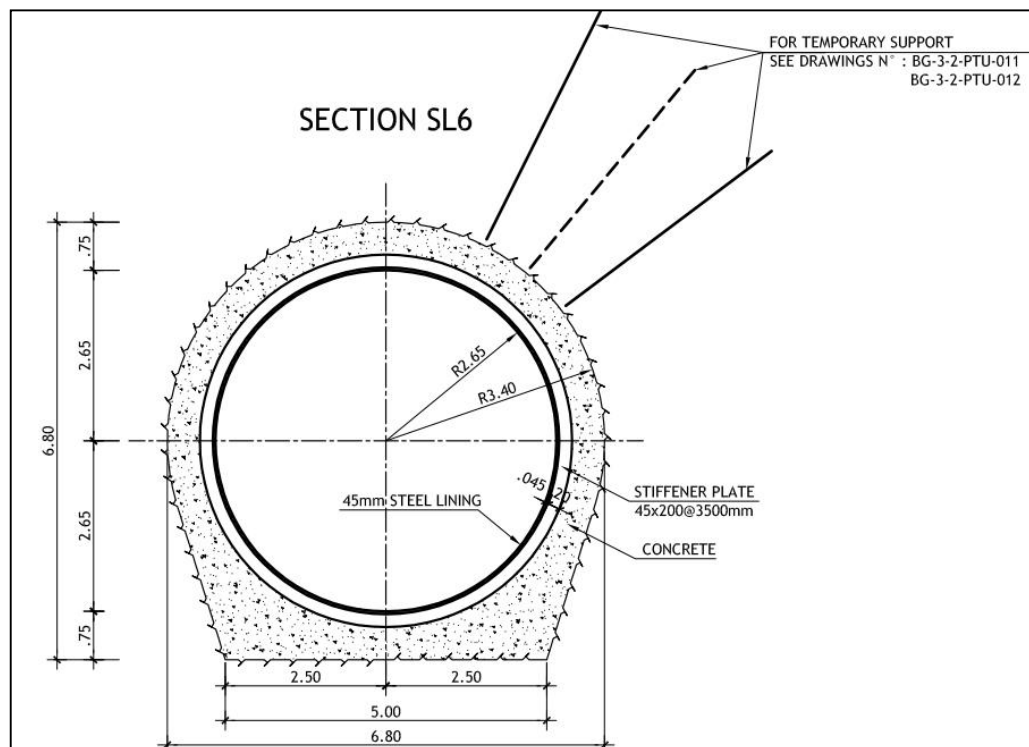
Headrace Steel lined tunnel -Typical Section
